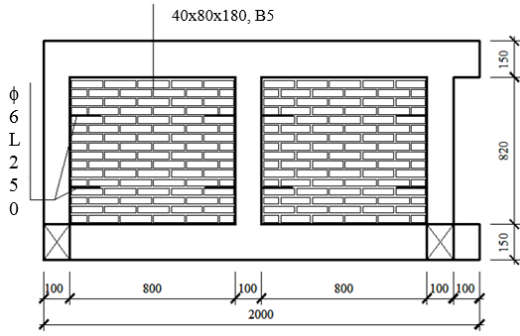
Frame K2 – RC frame with infill wall of non-fired solid bricks $40 \times 80 \times 180$ mm.
